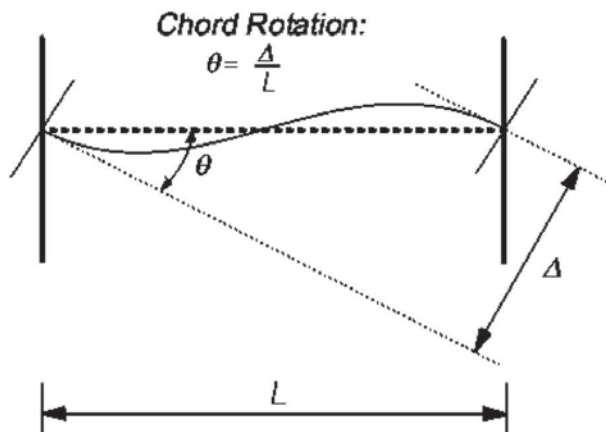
Chord Rotation for Structural Wall Coupling Beams
